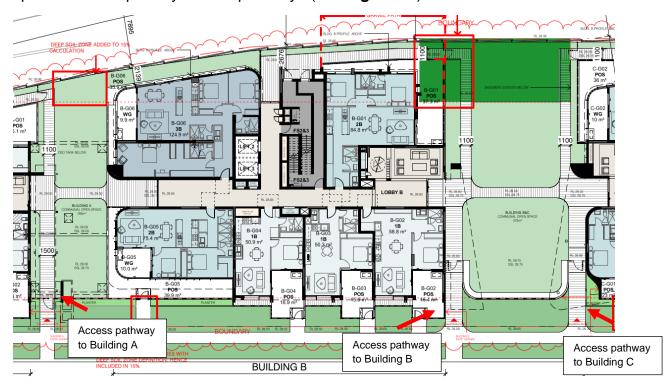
Landscape plan demonstrating primary access pathways to each building.
